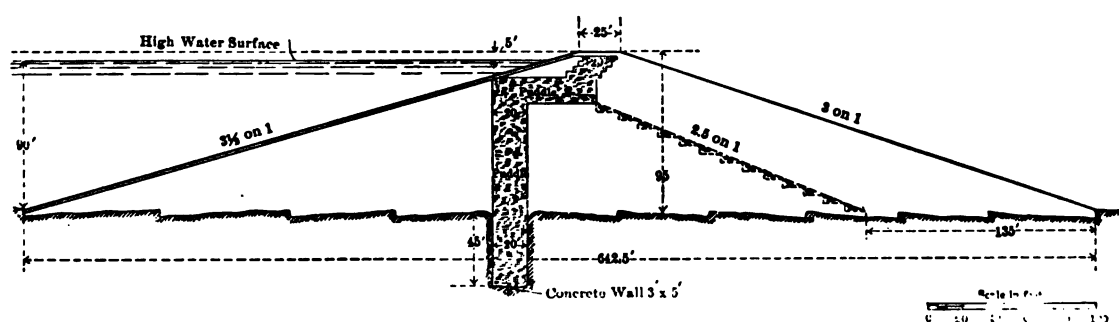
CROSS-SECTION OF SAN ANDRES DAM.
